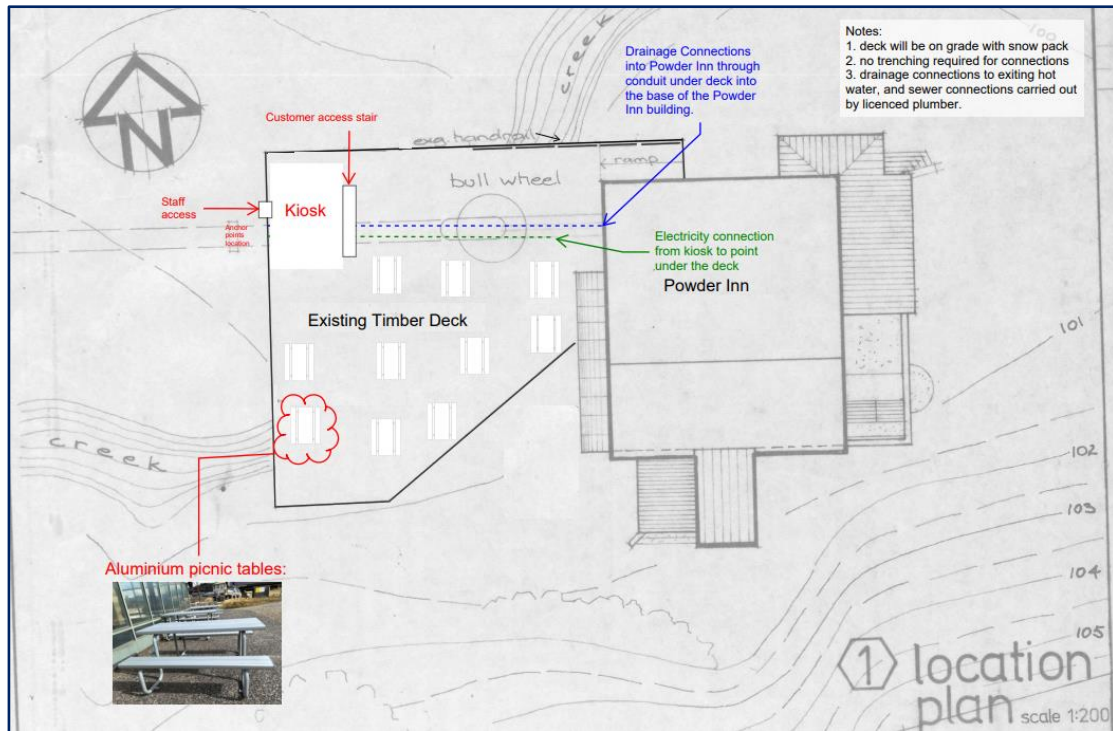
| Location Plan identifying the location of the kiosk site and style of tables proposed on the deck
